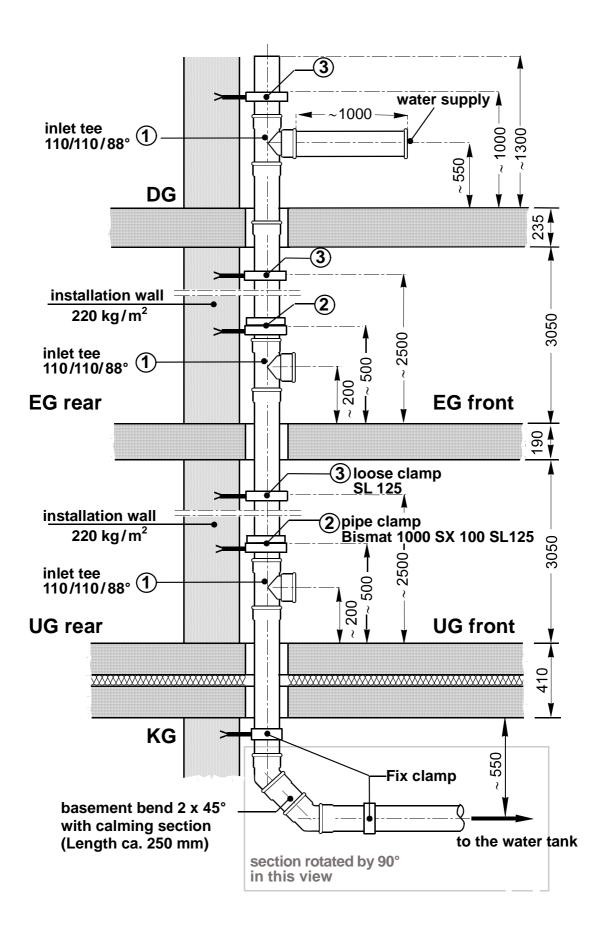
Installation plan of the pipe system "HAKAN SiLENTA Premium Highly Noise-Insulated Pipes (OD 110)" (manufacturer: HAKAN), mounted with clamps "Bismat 1000 (SX100/SL125)" (drawing not to scale, dimensions in mm).
